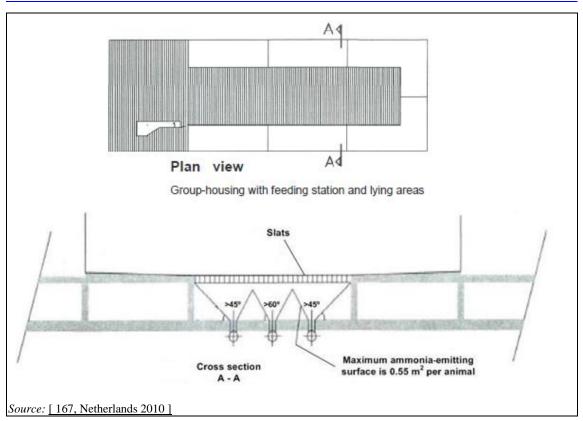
Cross section and plan view of the floor in a housing system for gestating sows with a manure channel with slanted walls
